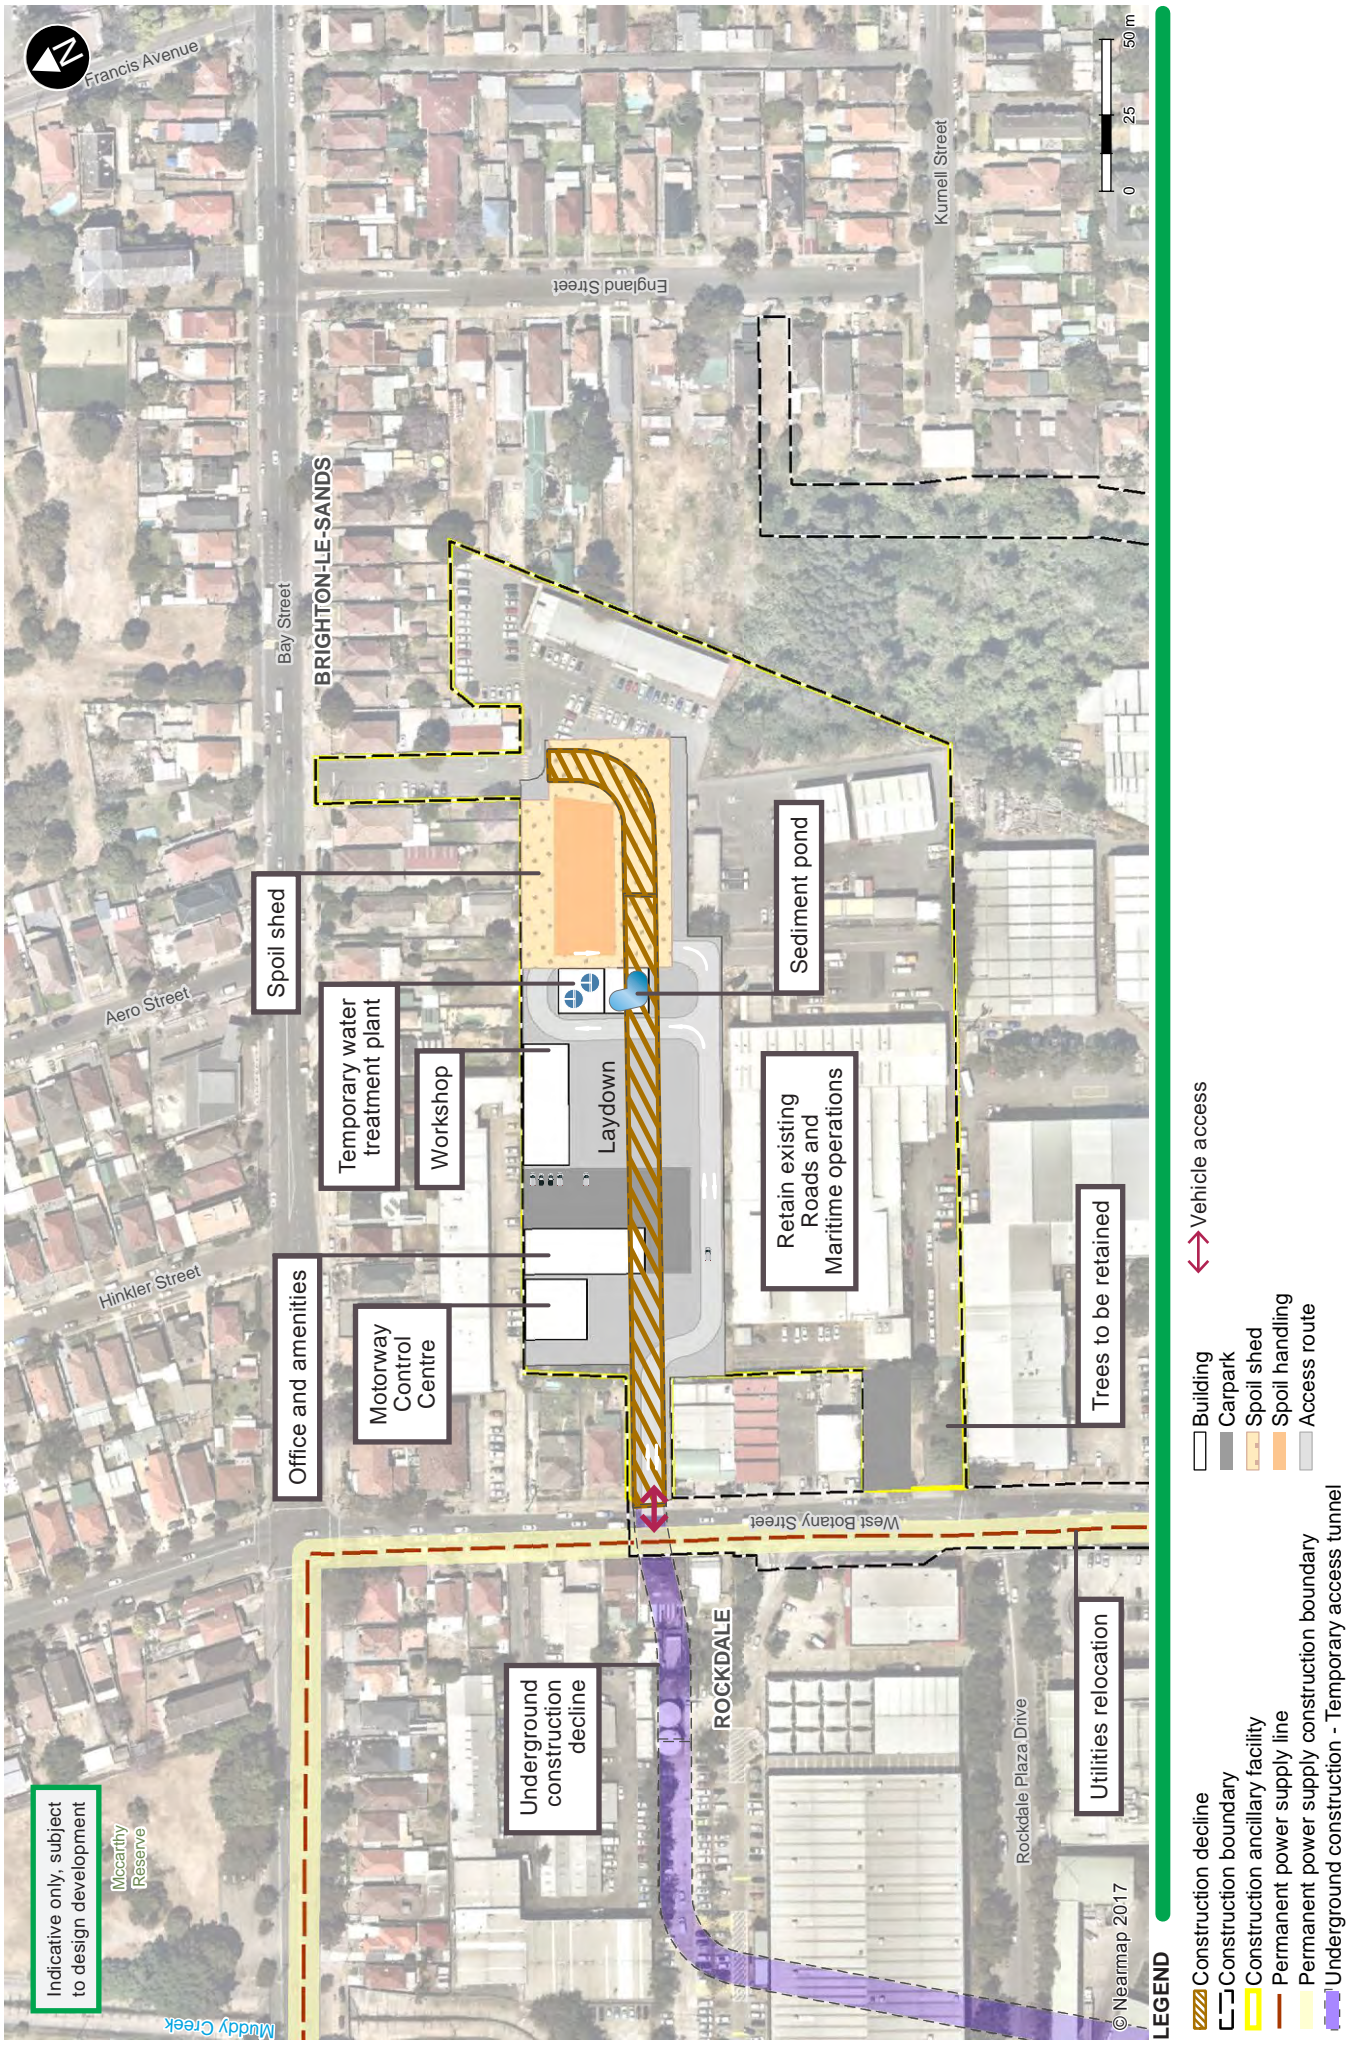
Rockdale construction ancillary facility (C2) layout
